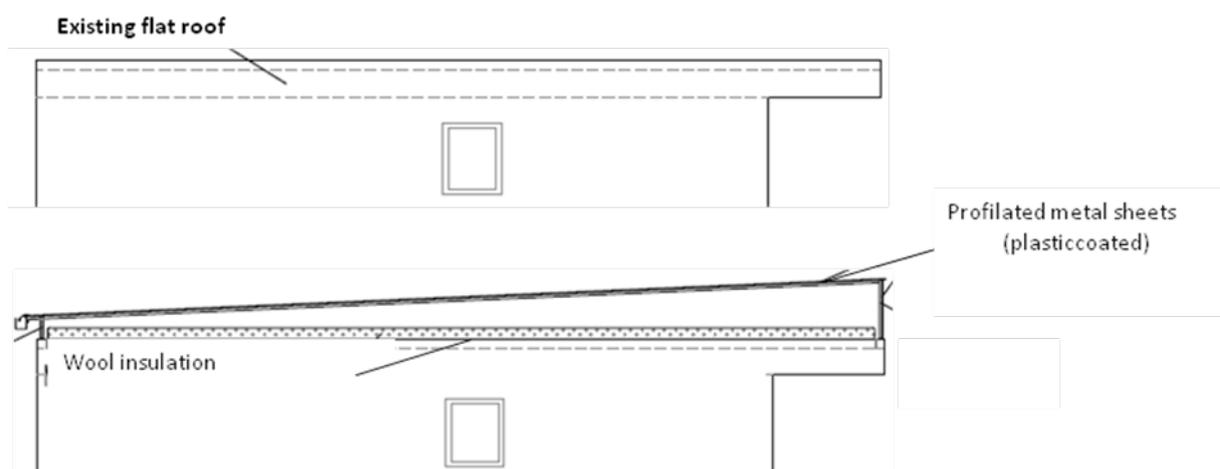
Sketch of added waterproof bearing structure with ventilated cavity underneath
